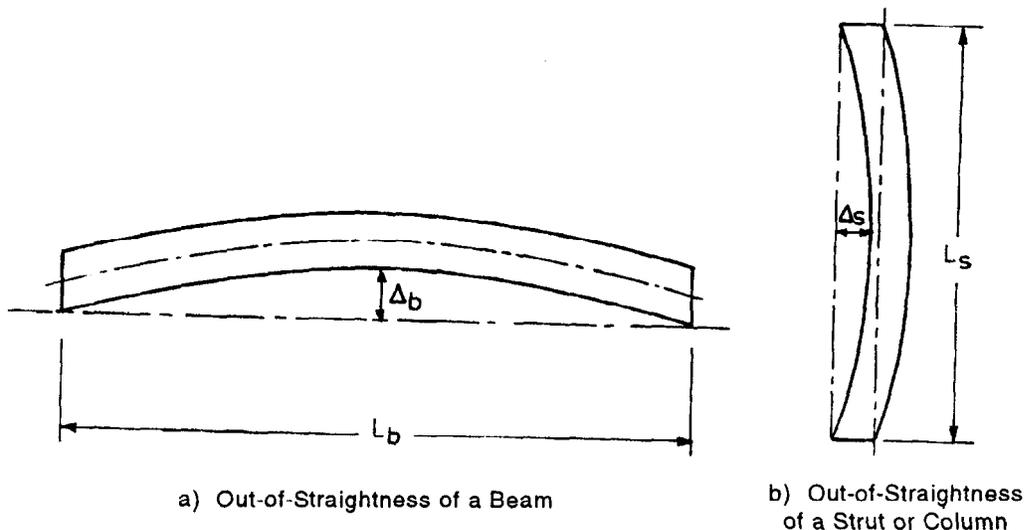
POINTS OF MEASUREMENT OF TOLERANCES FOR PURPOSELY FABRICATED STEEL WORK
